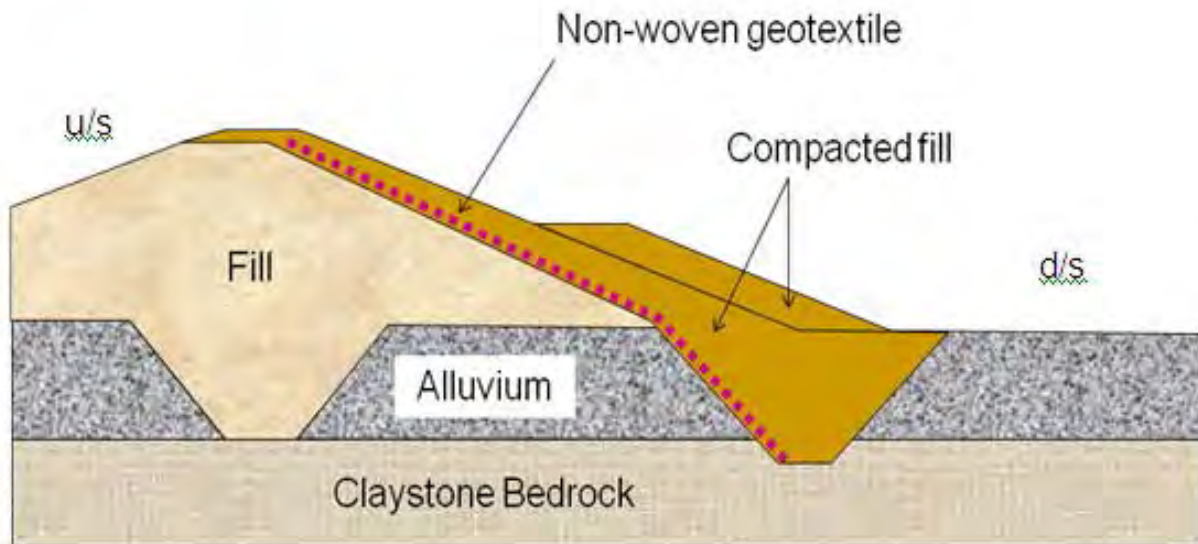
Typical cross section, Olmitos-Garcias No. 2 dam repair.
